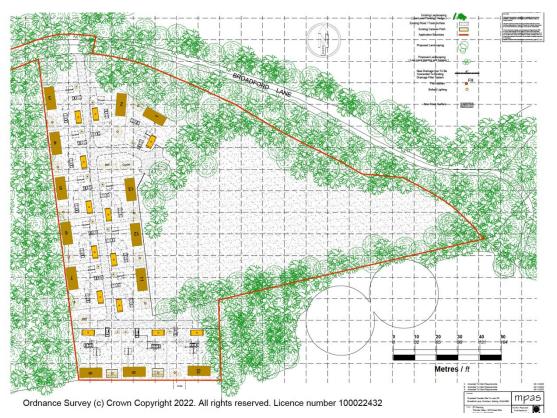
Illustrative layout showing a potential capacity of 13 pitches.
